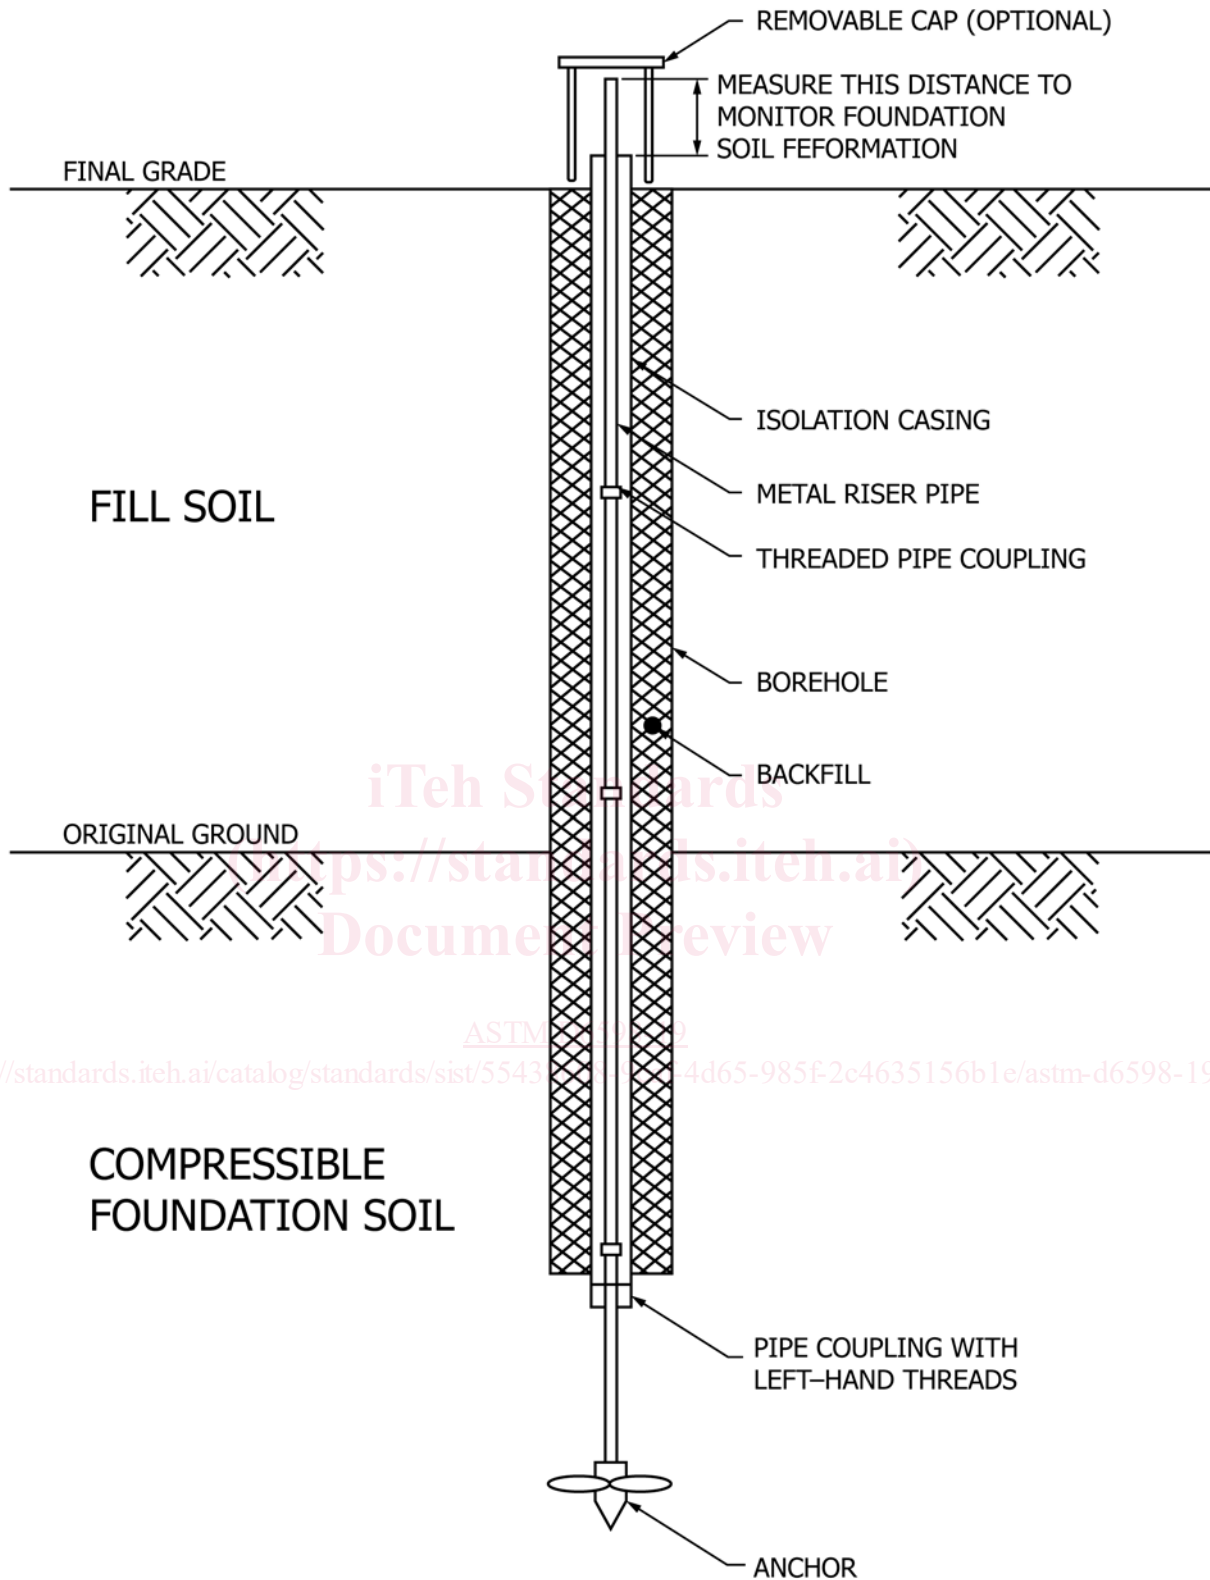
Typical Installation for Borehole Installed Externally Referenced Settlement Point with Anchor
